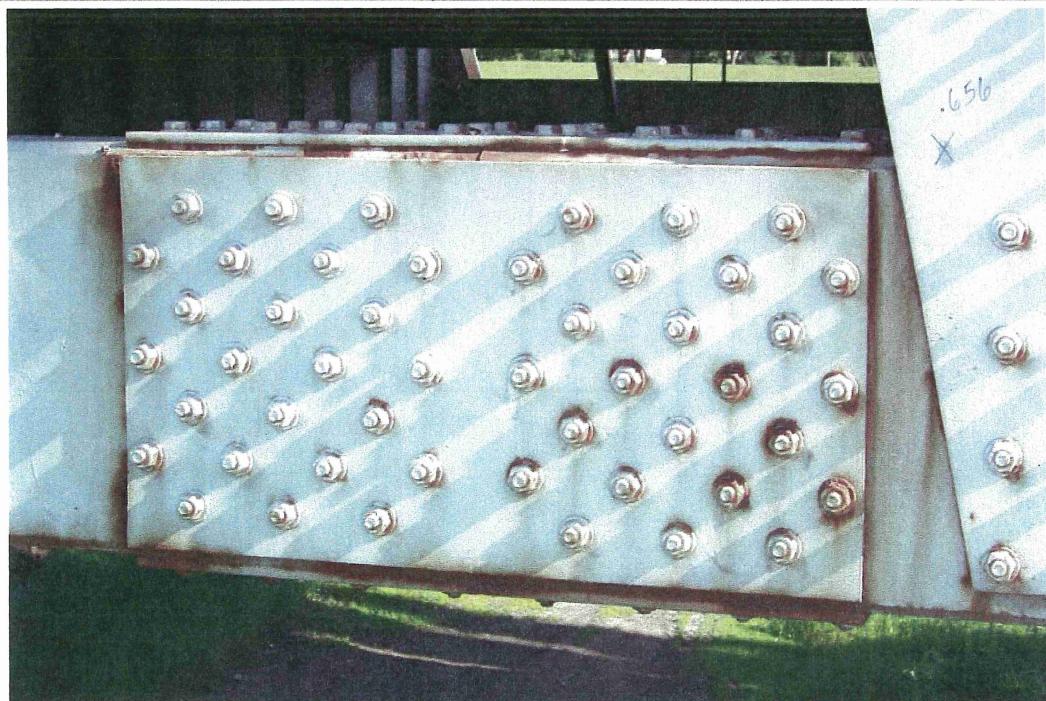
West Truss Span (Span 6), south truss, typical lower chord splice connection. Rust is developing between splice plates and lower chord members. Looking north.
